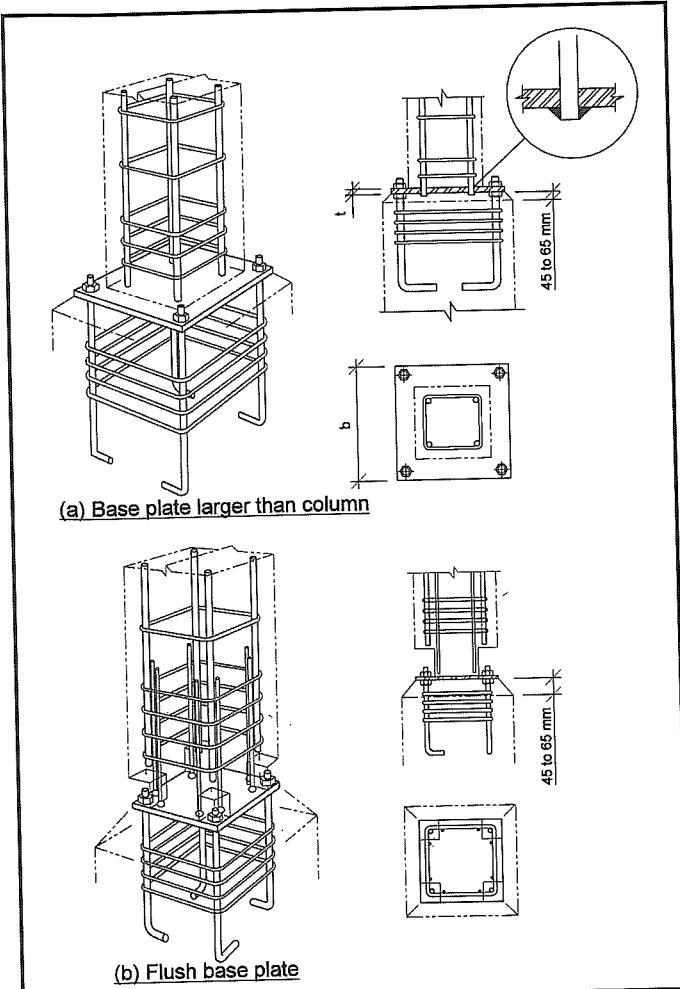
Column Base Plate Connections (references 5 and 9)
